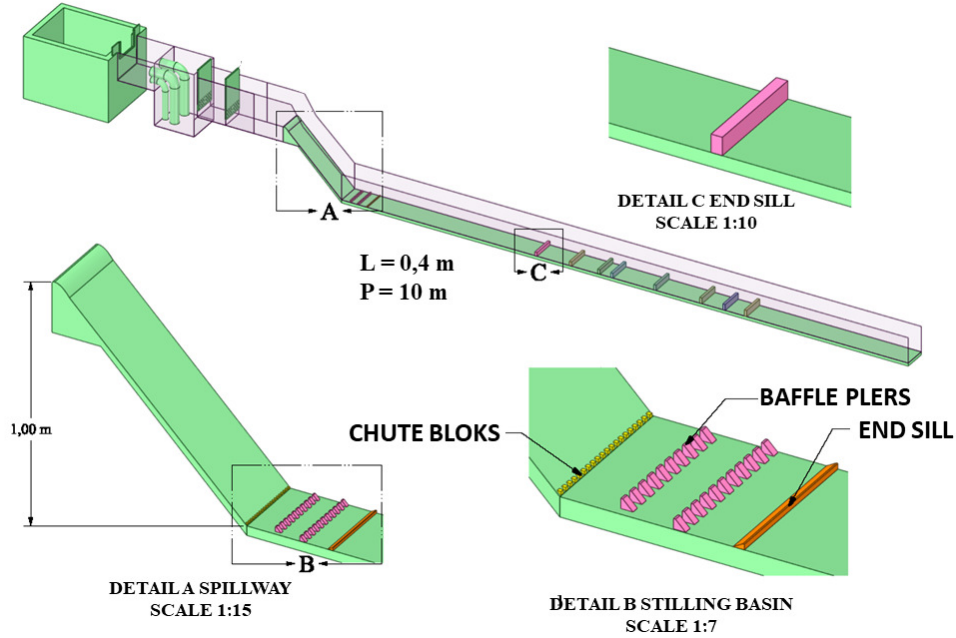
Sectional view of USBR Type II stilling basin (Configuration B).
